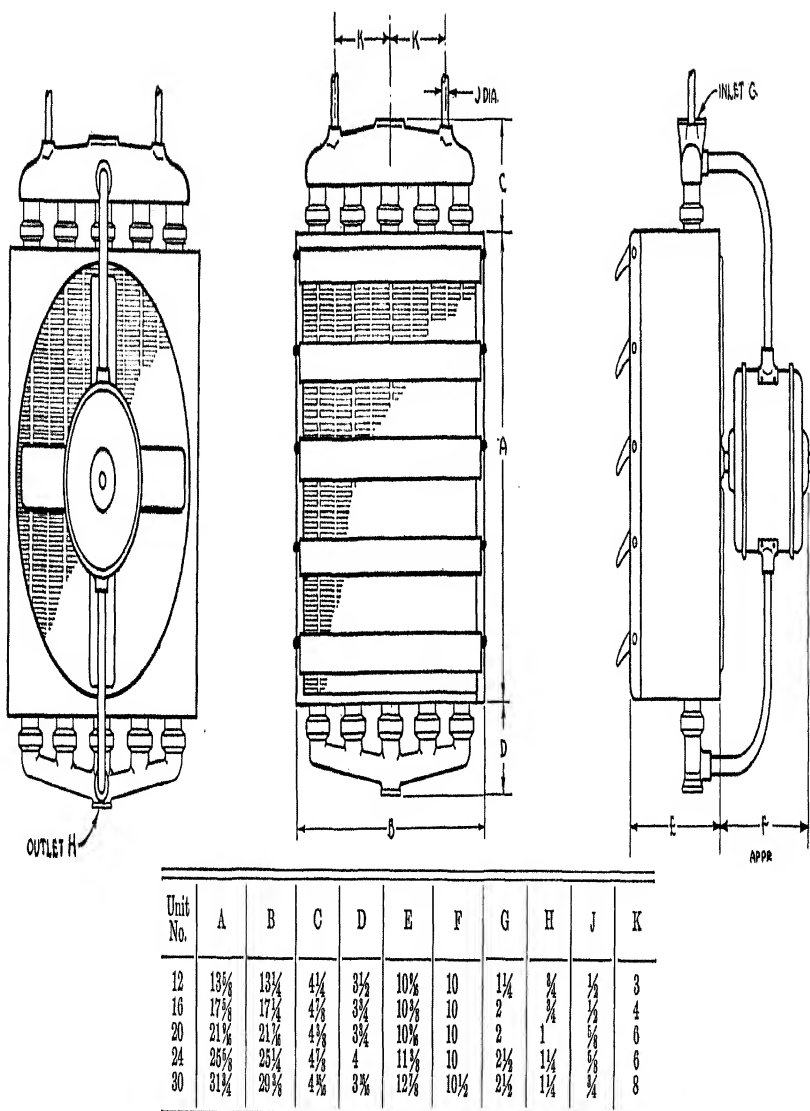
Front, Side, and Rear Views of a Typical Unit Heater and Dimensions for Five Common Sizes
